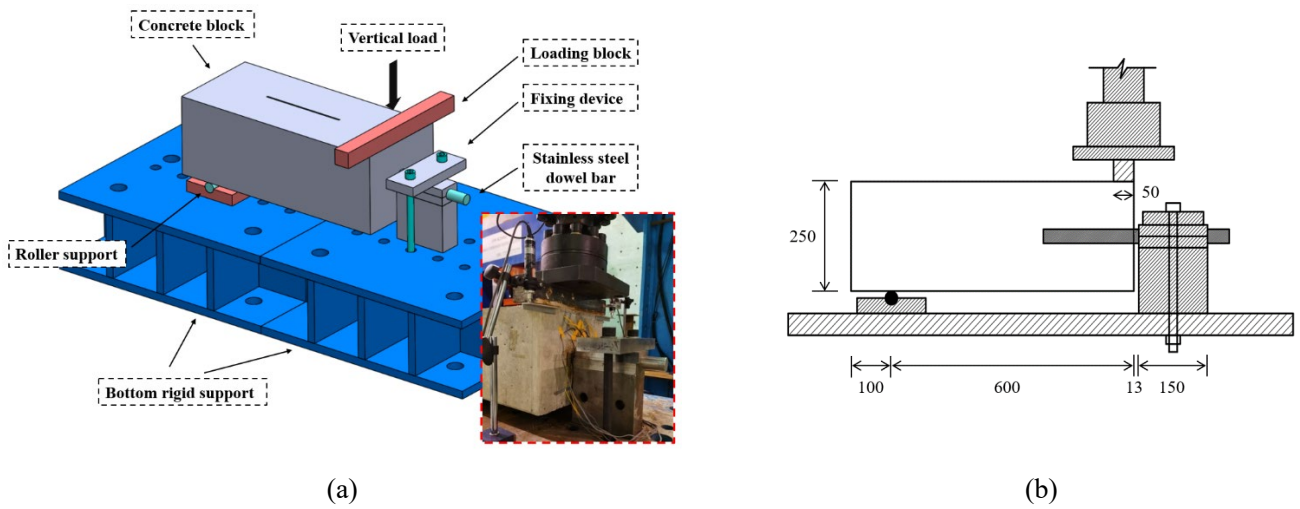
Experimental test setup (a) axonometric view, (b) schematic view (Unit: mm).
